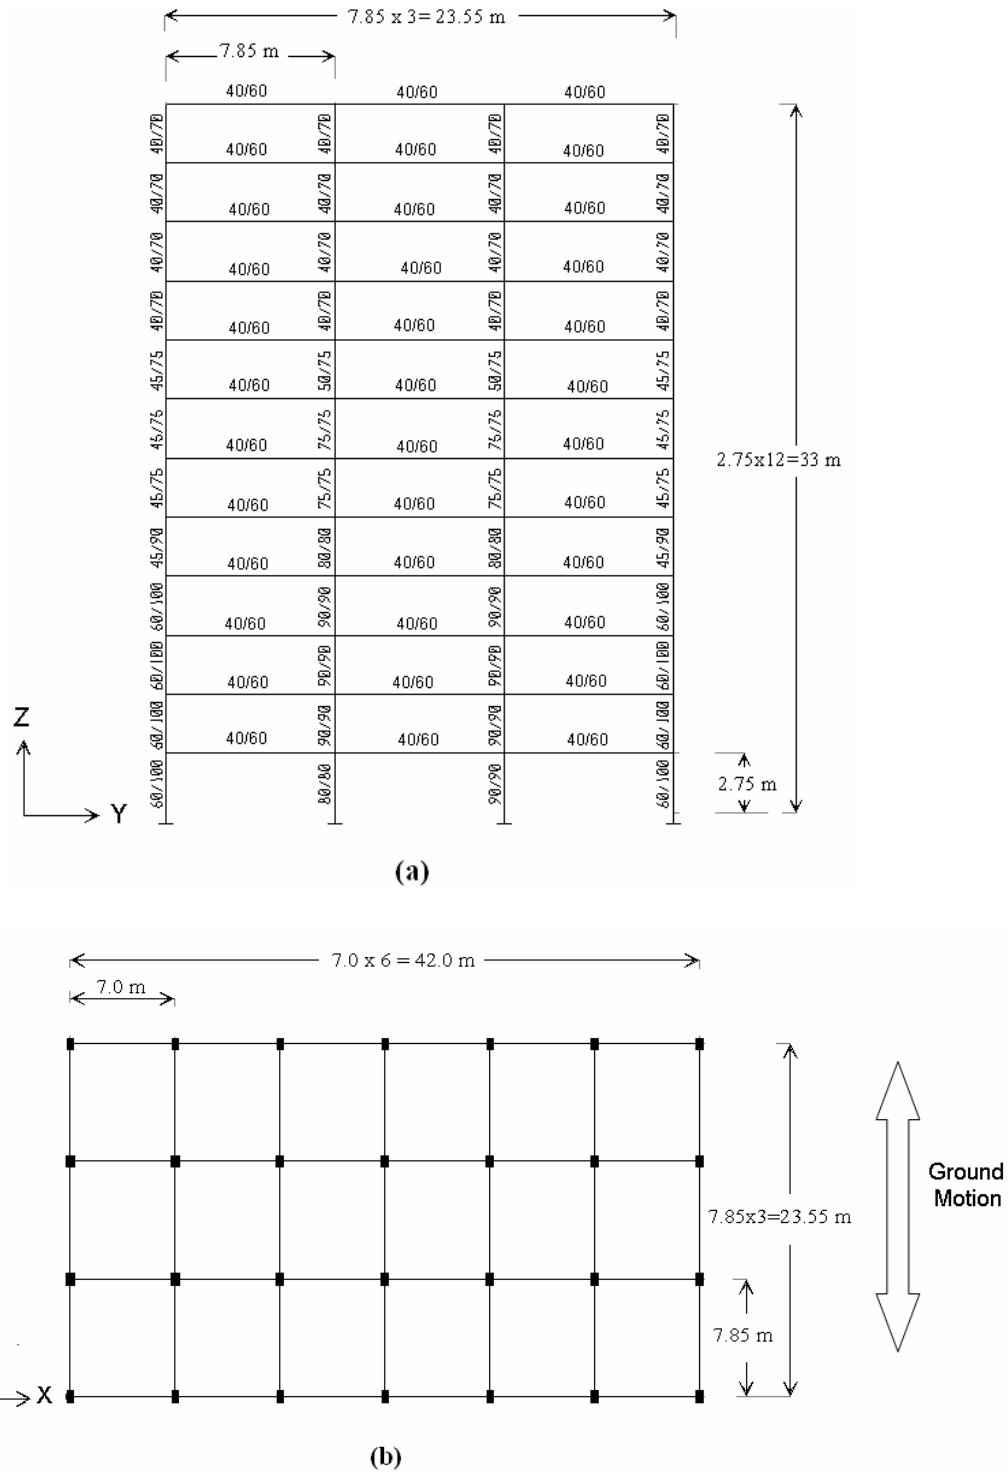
A layout for a) elevation, b) floor plan of the existing building
